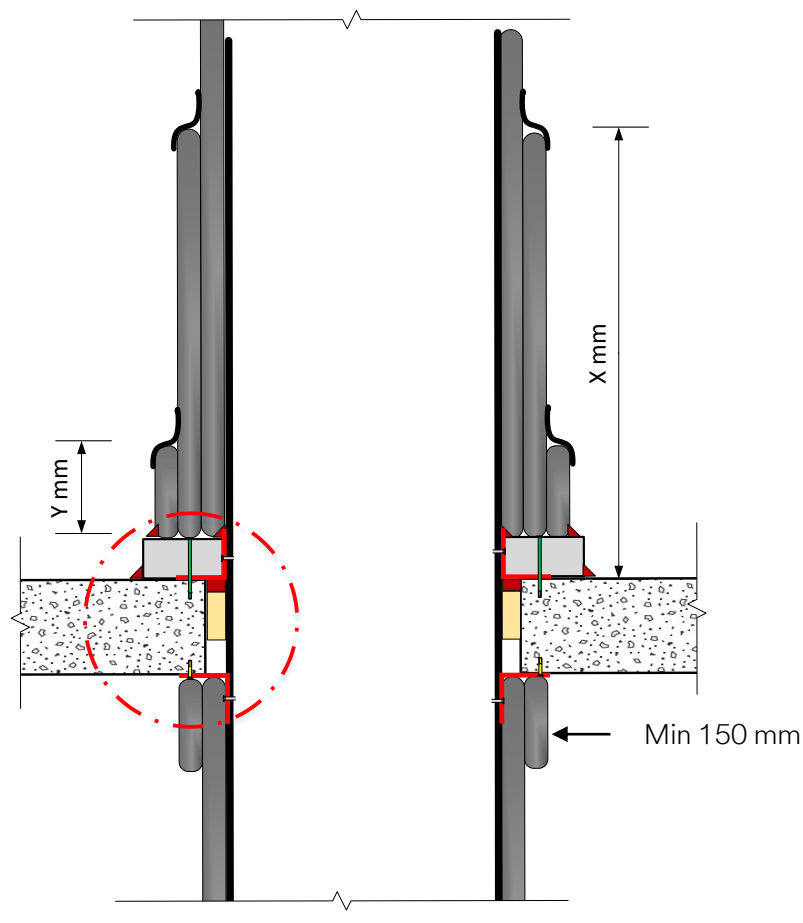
General Layering configuration. Note – layering and penetration detail is asymmetrical about the separating element. Note : CP25WB+ is applied in a min 15 mm fillet where the top layer of 615+ duct wrap interfaces with the gypsum board collar.
